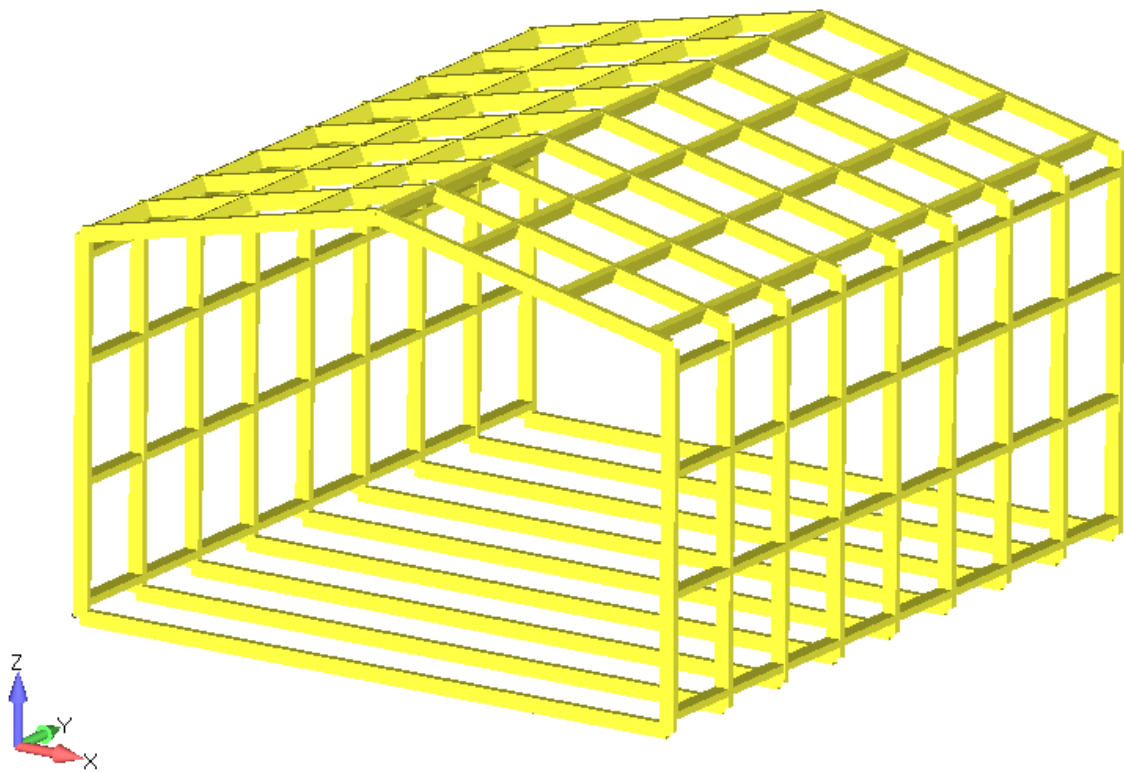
General view of the FINHA-A150L gable roof building frame, 2.4 meters wide, slope is 12 deg.
